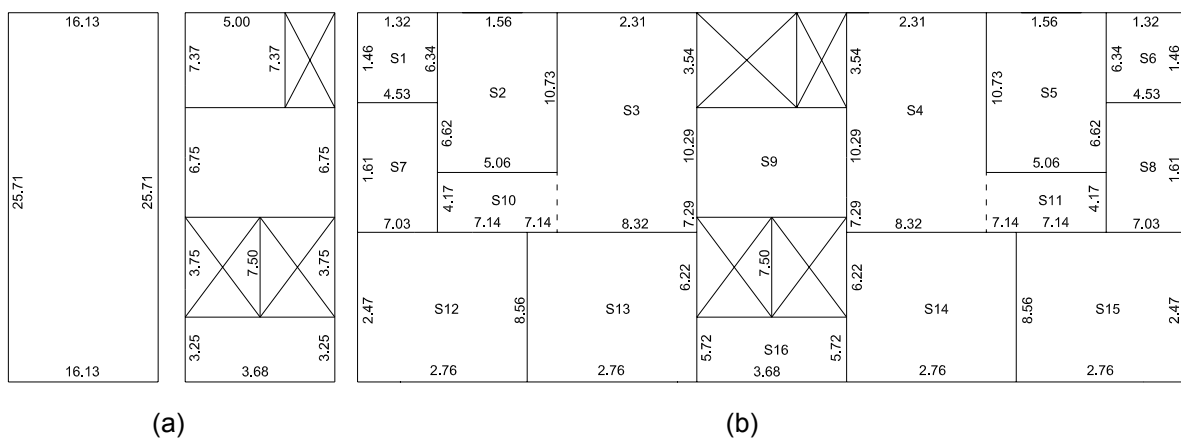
Reactions of slabs in walls: (a) typical floor and (b) elevator room and water reservoir.
